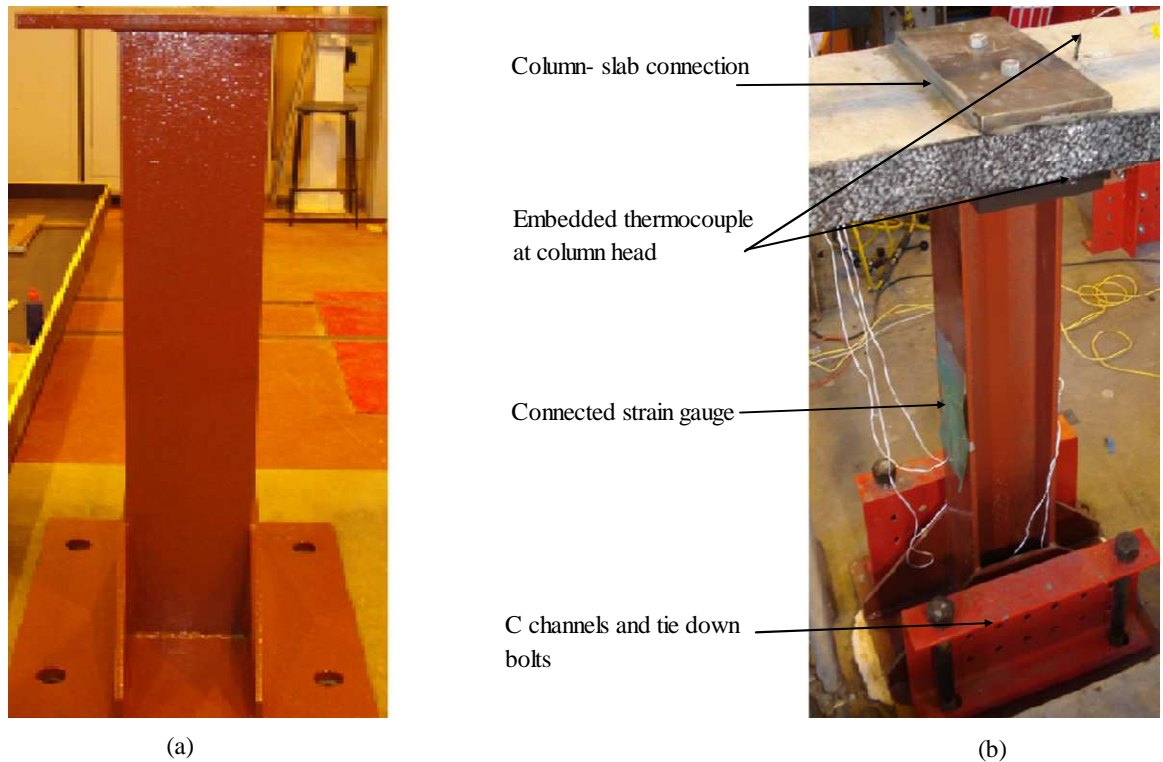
Column support (a) pre-assembly and (b) after connection to strong floor and slab.
